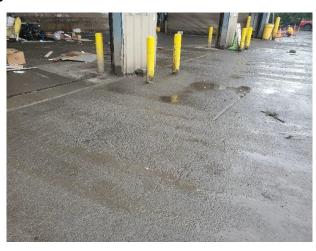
Cracked Pavement at Transfer Truck Exit
